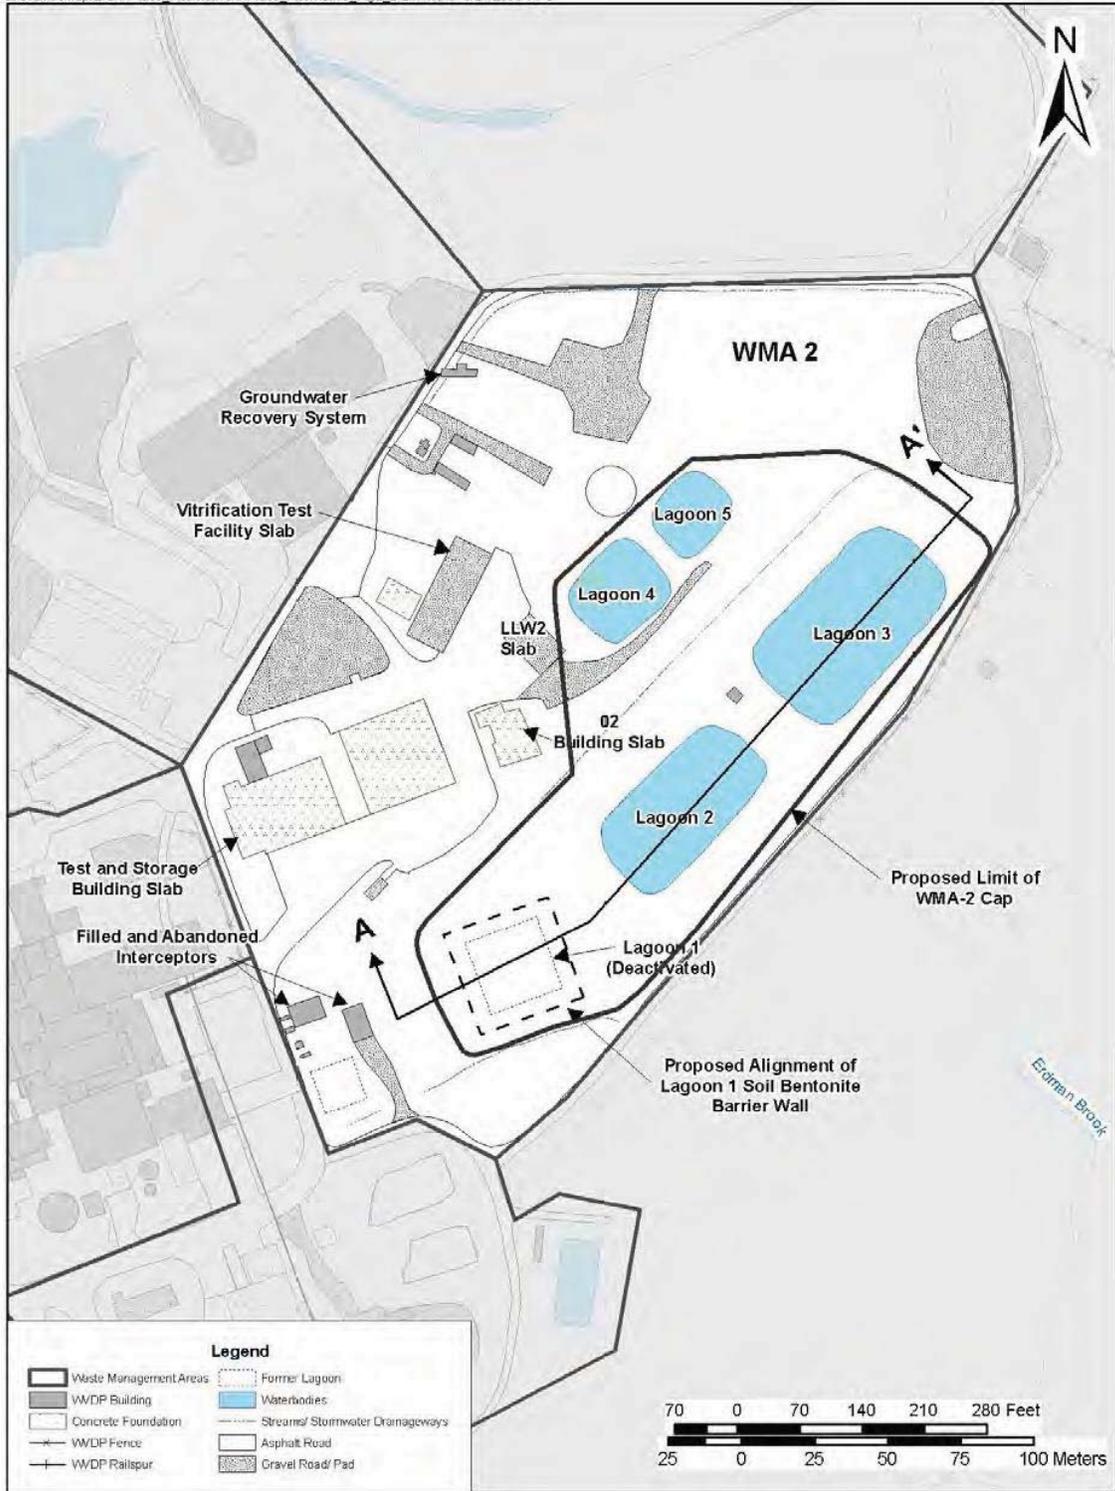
(Figure 2-10 in Sitewide report) WMA 2 Cap and Barrier Wall
